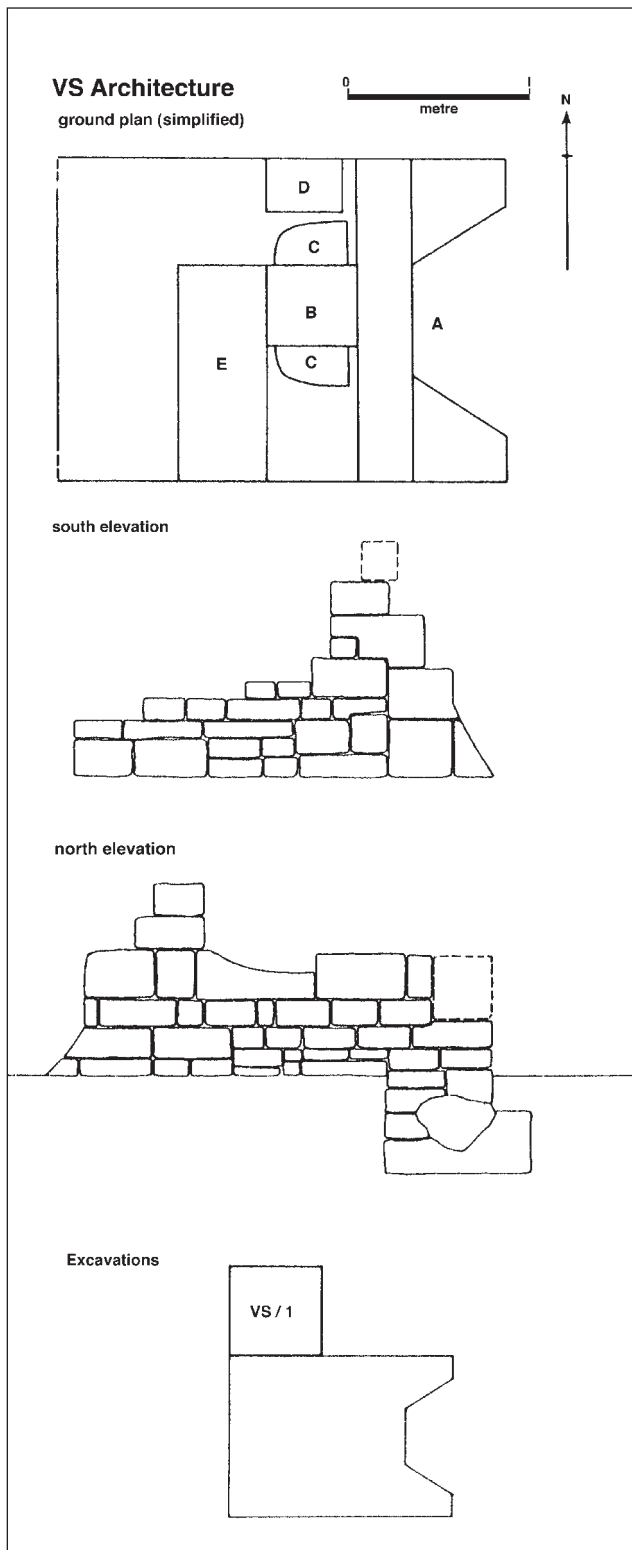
Smithy: ground plan, elevations and plan of excavation.
